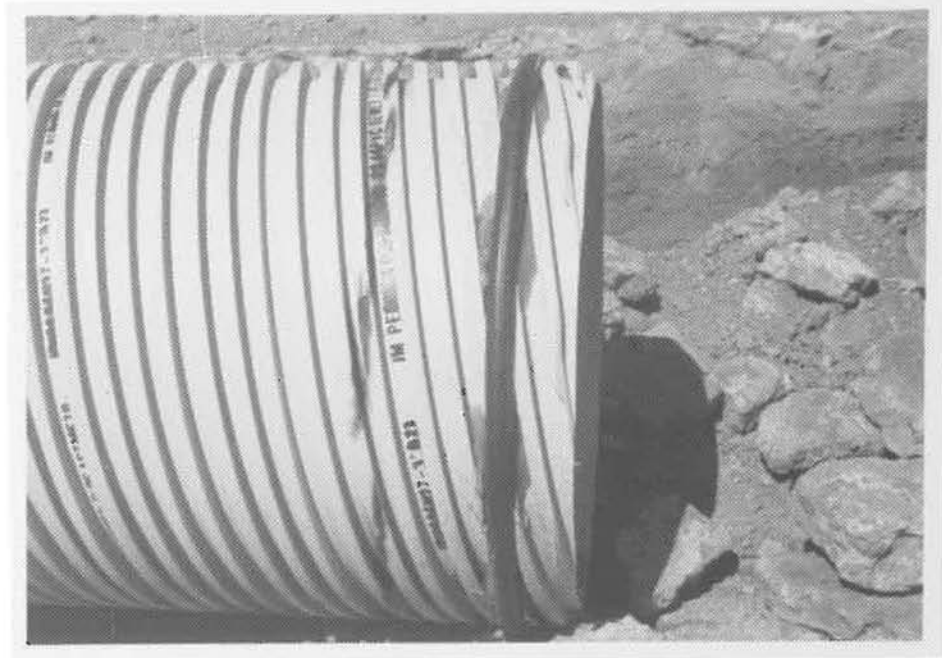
21" JM PVC Sewer Pipe. Note that sealant was required to fill gaps under the gasket.
